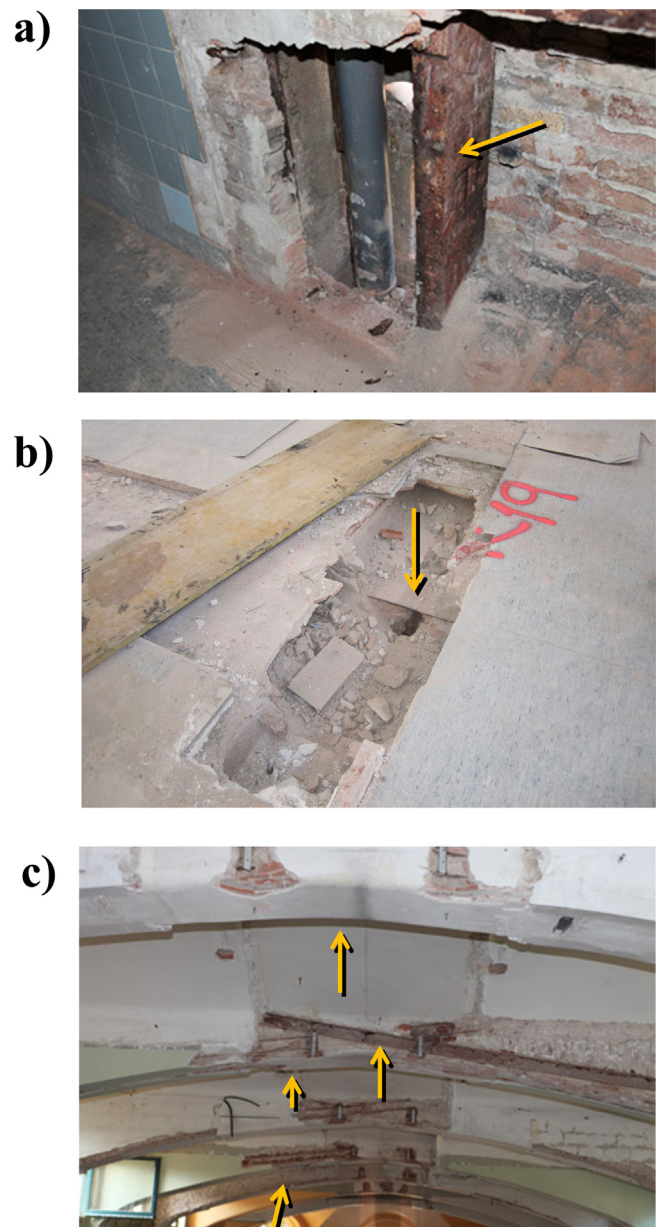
Metallic structures based on pillars (a), beams (b) and purlin from roof truss (c). Arrows indicate the zones where the corroded profiles are located.
